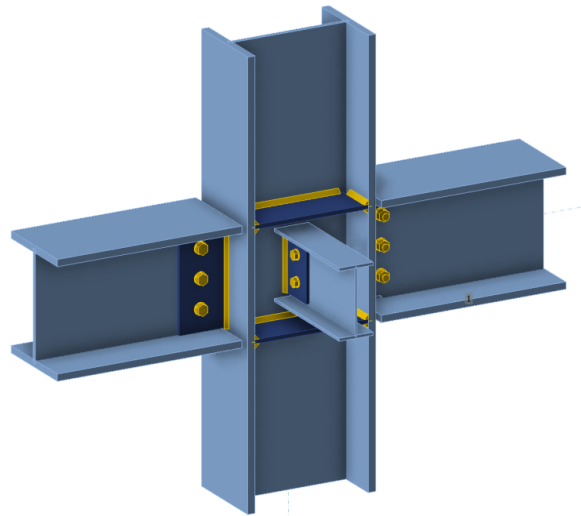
Detail of a hinged connection used in the model building. Column: HEB450; Main beams: HEB400; Secondary beams: IPE240. Dimension can be found in Table 6.5
